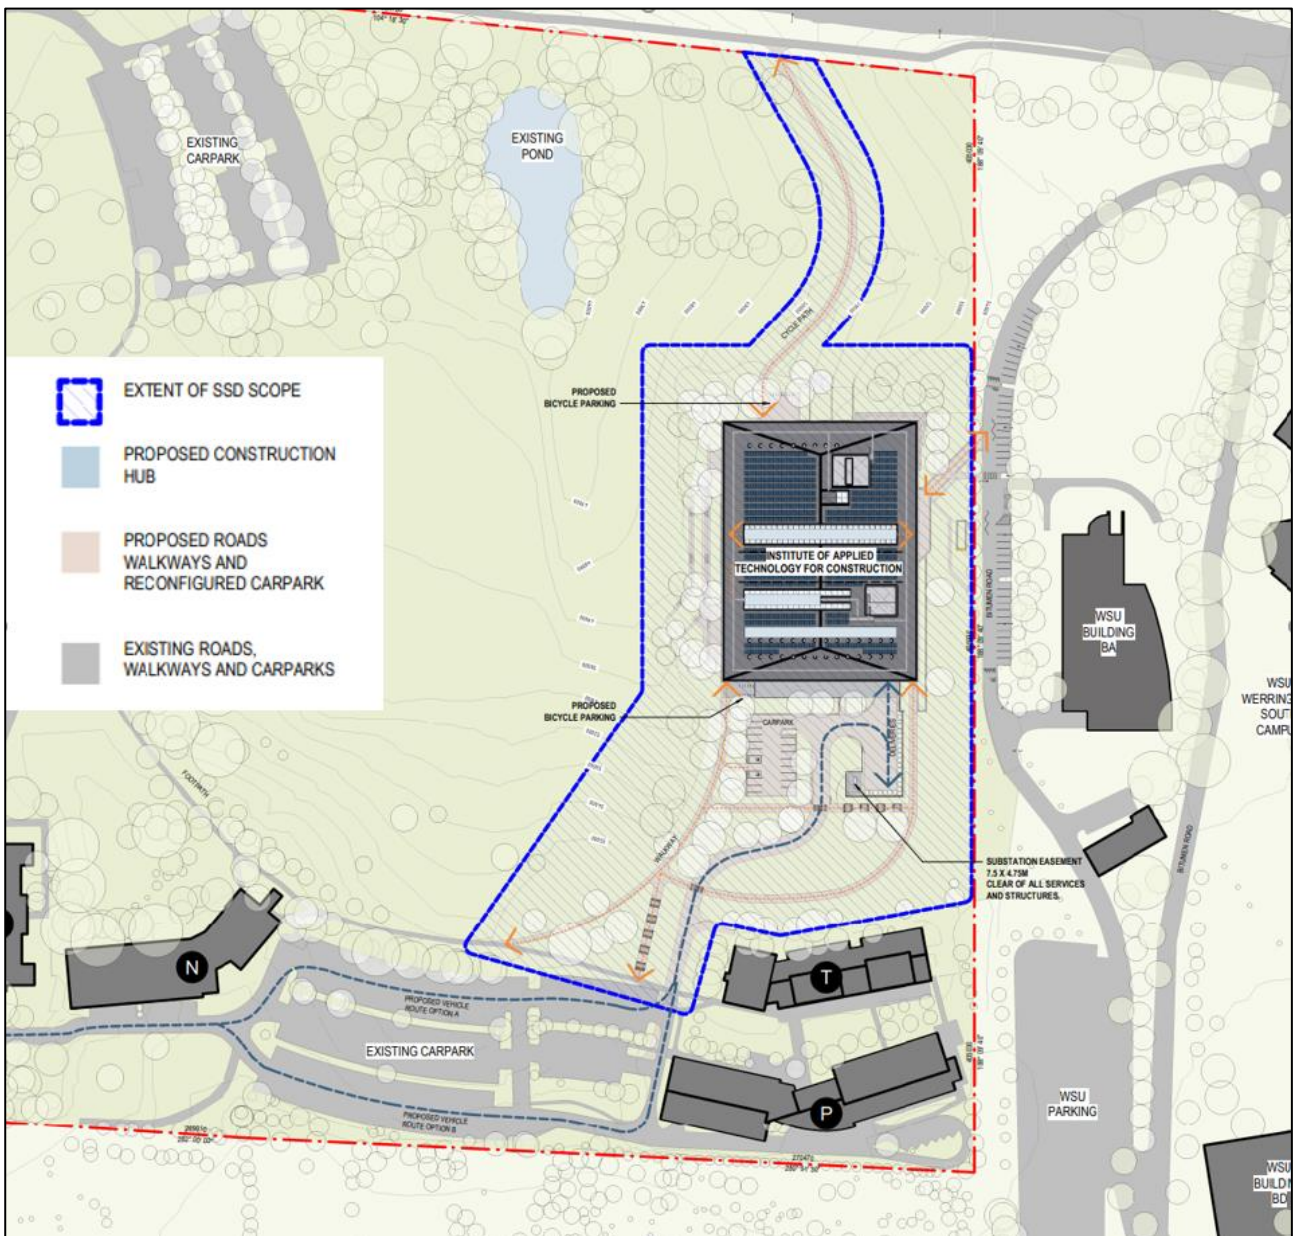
Proposed site layout (Submissions Report – Appendix C Amended Architectural Plans Urbis, June 2021)
